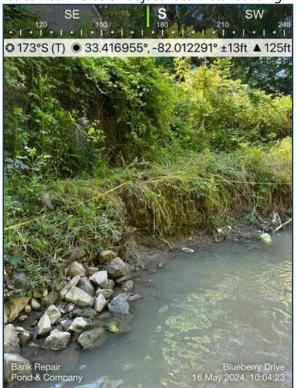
Looking downstream at left bank just beyond 2505 Blueberry Drive.
